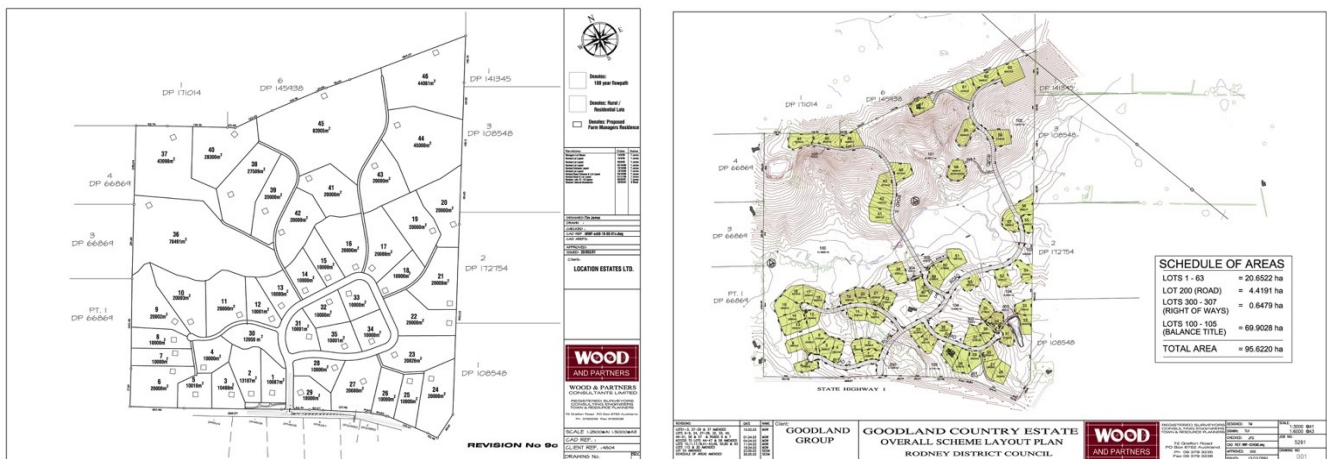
Goodland Estates: Original subdivision layout (left) (TP124) and consented subdivision layout (right) (Sources: Woods and Earl Shaver)
